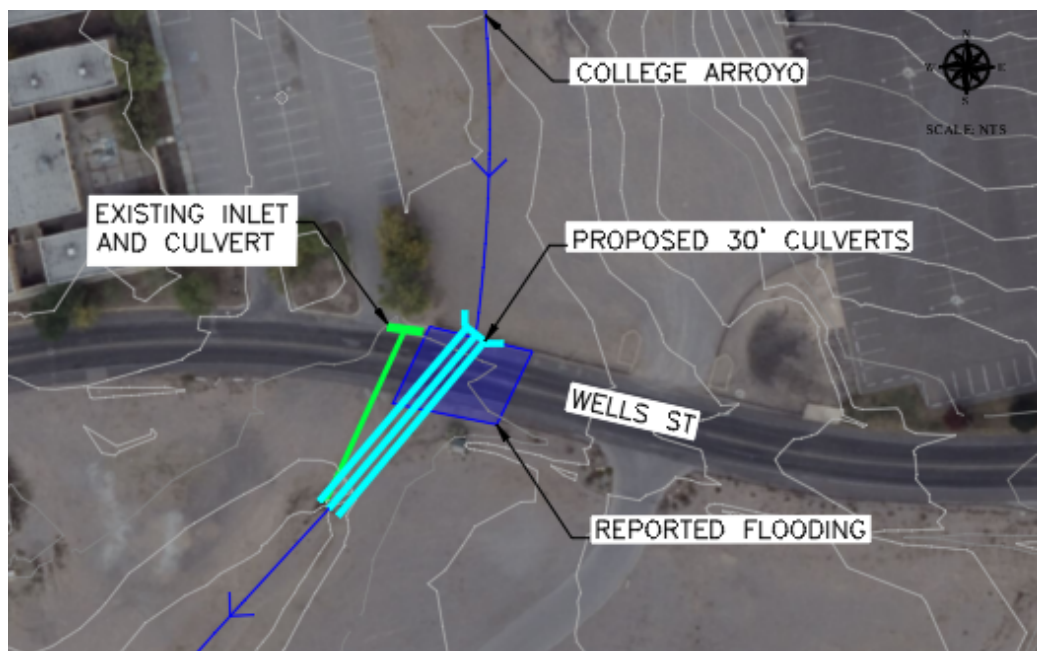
COLLEGE ARROYO CROSSING AT WELLS ST
